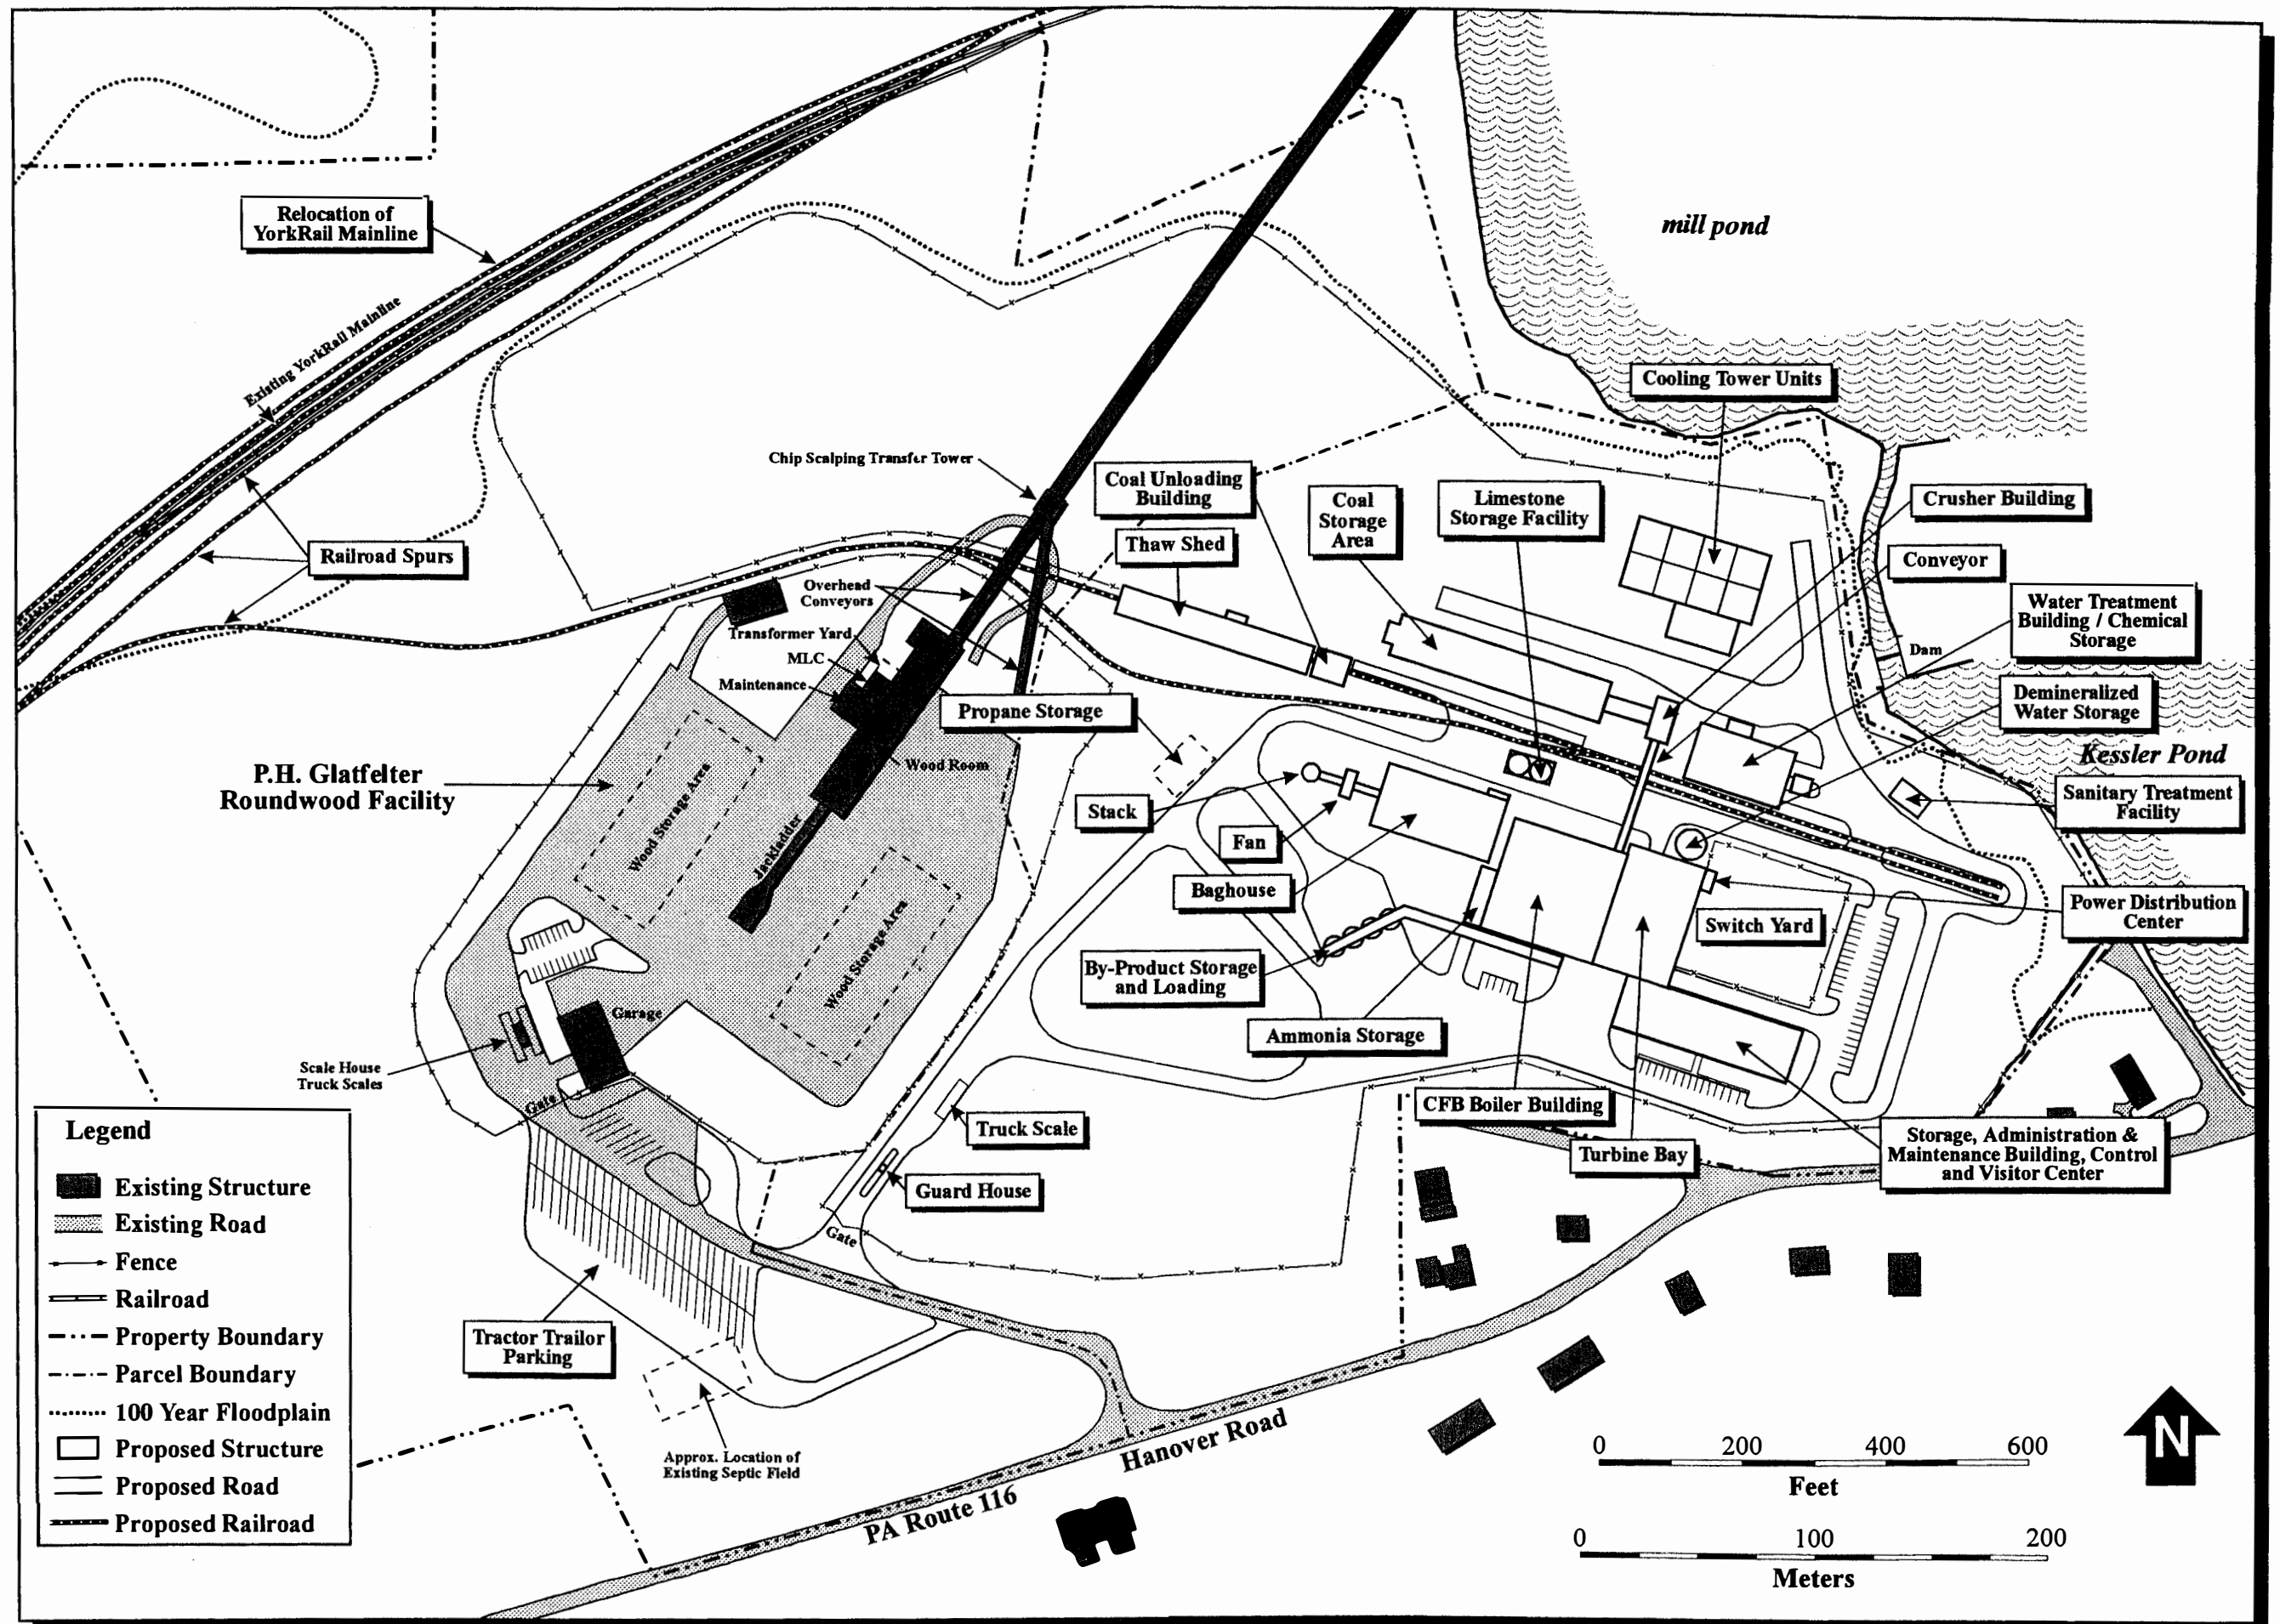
Proposed YCEP cogeneration facility site plan for the North Codorus Township site.
